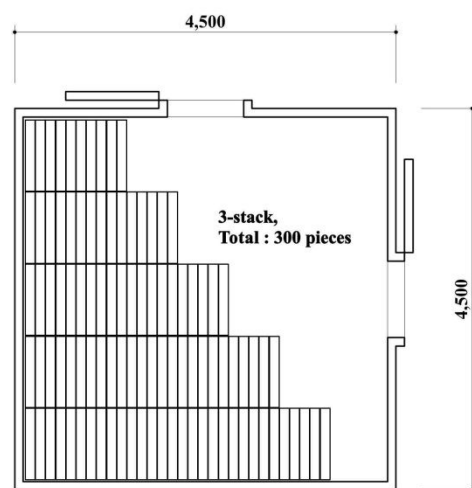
(3) Layout Plan of the Temporary Ice Storage
